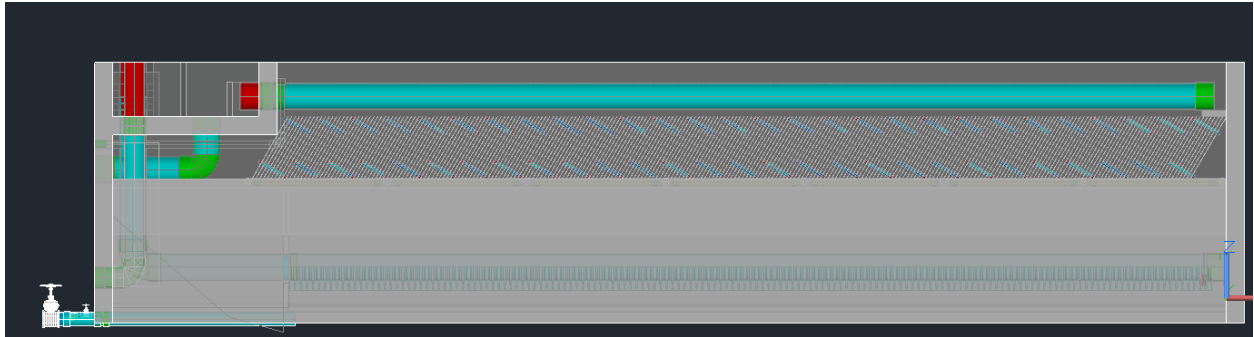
Sedimentation Tank Exit Channel AutoCAD Drawing Left View
